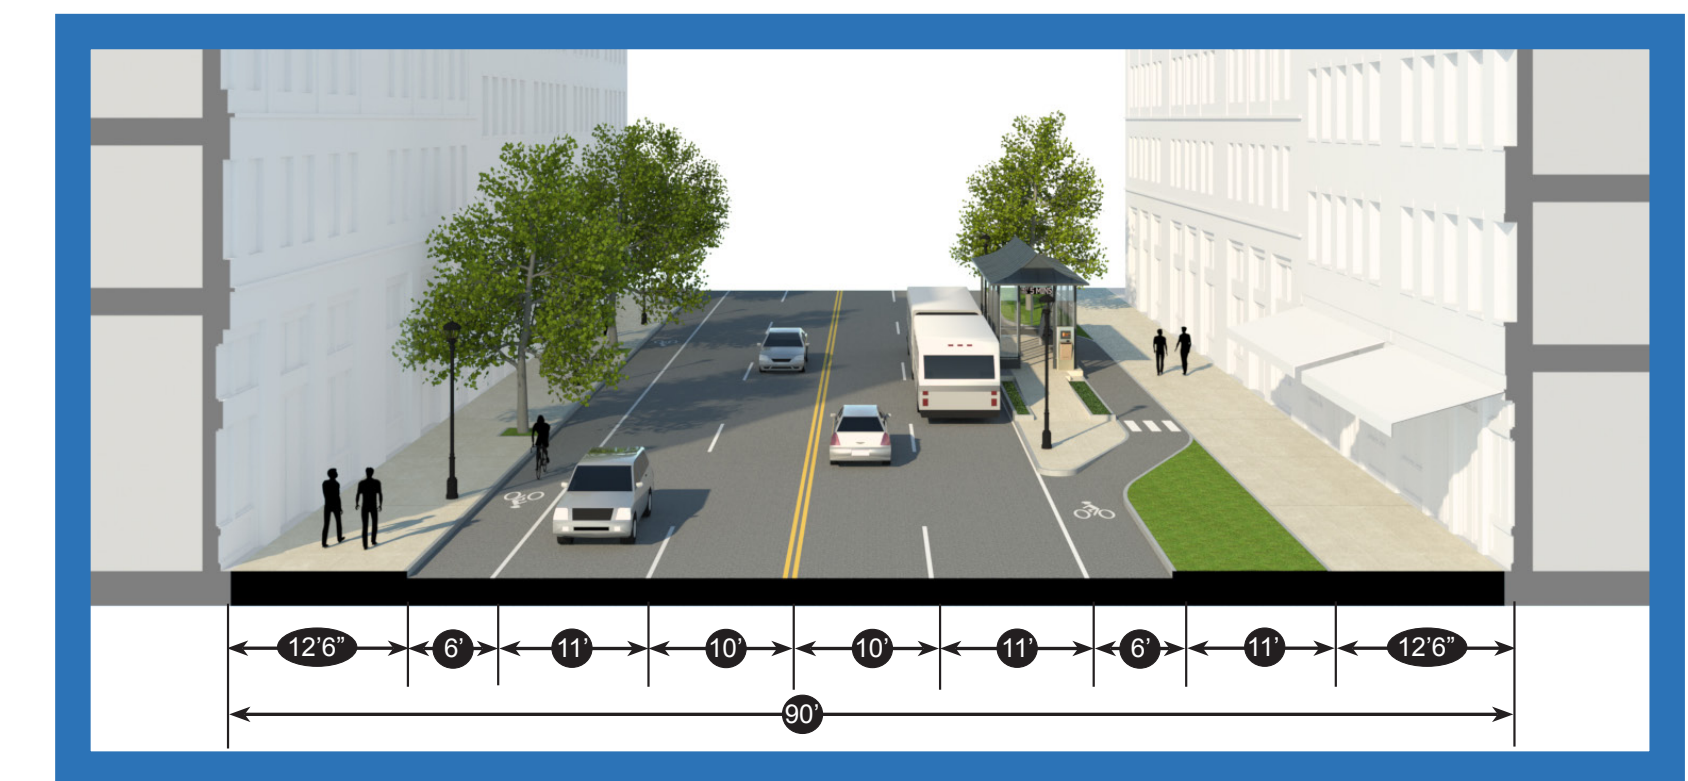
Narrowest Section of Broadway. The right-of-way on Broadway varies. At its narrowest, the street section should include two BRT lanes, two car lanes, two bike lanes and sidewalks with street trees.
